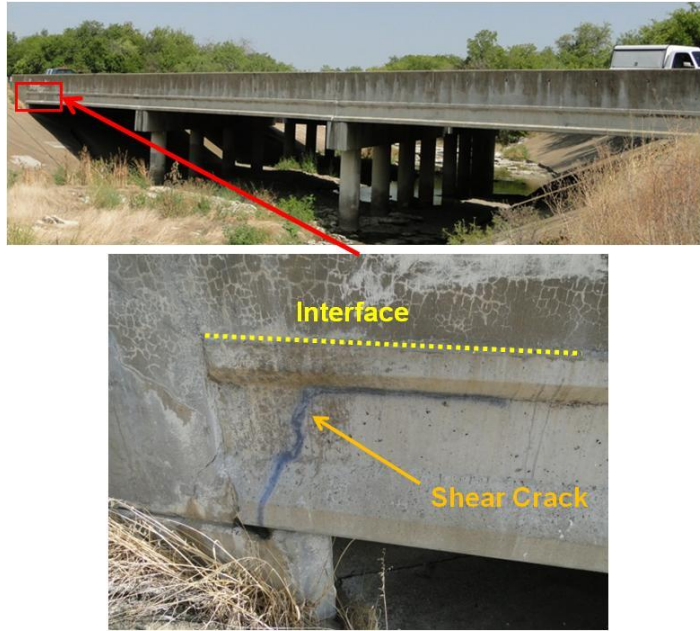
Shear cracks observed at the South-West end of the Long Ave. Bridge
